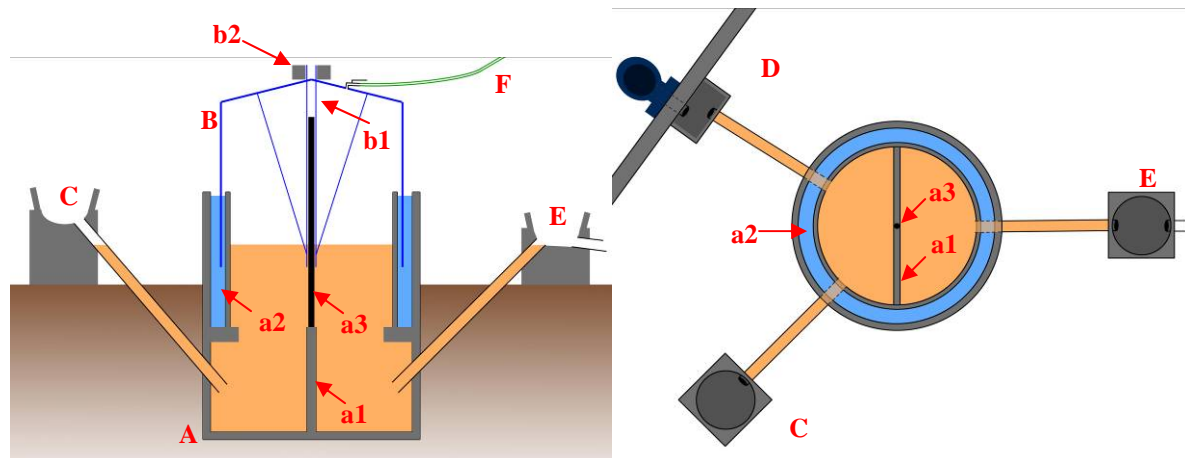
Cross section and top view of a 2m³ toilet linked plant installed in Kumbalangi.
